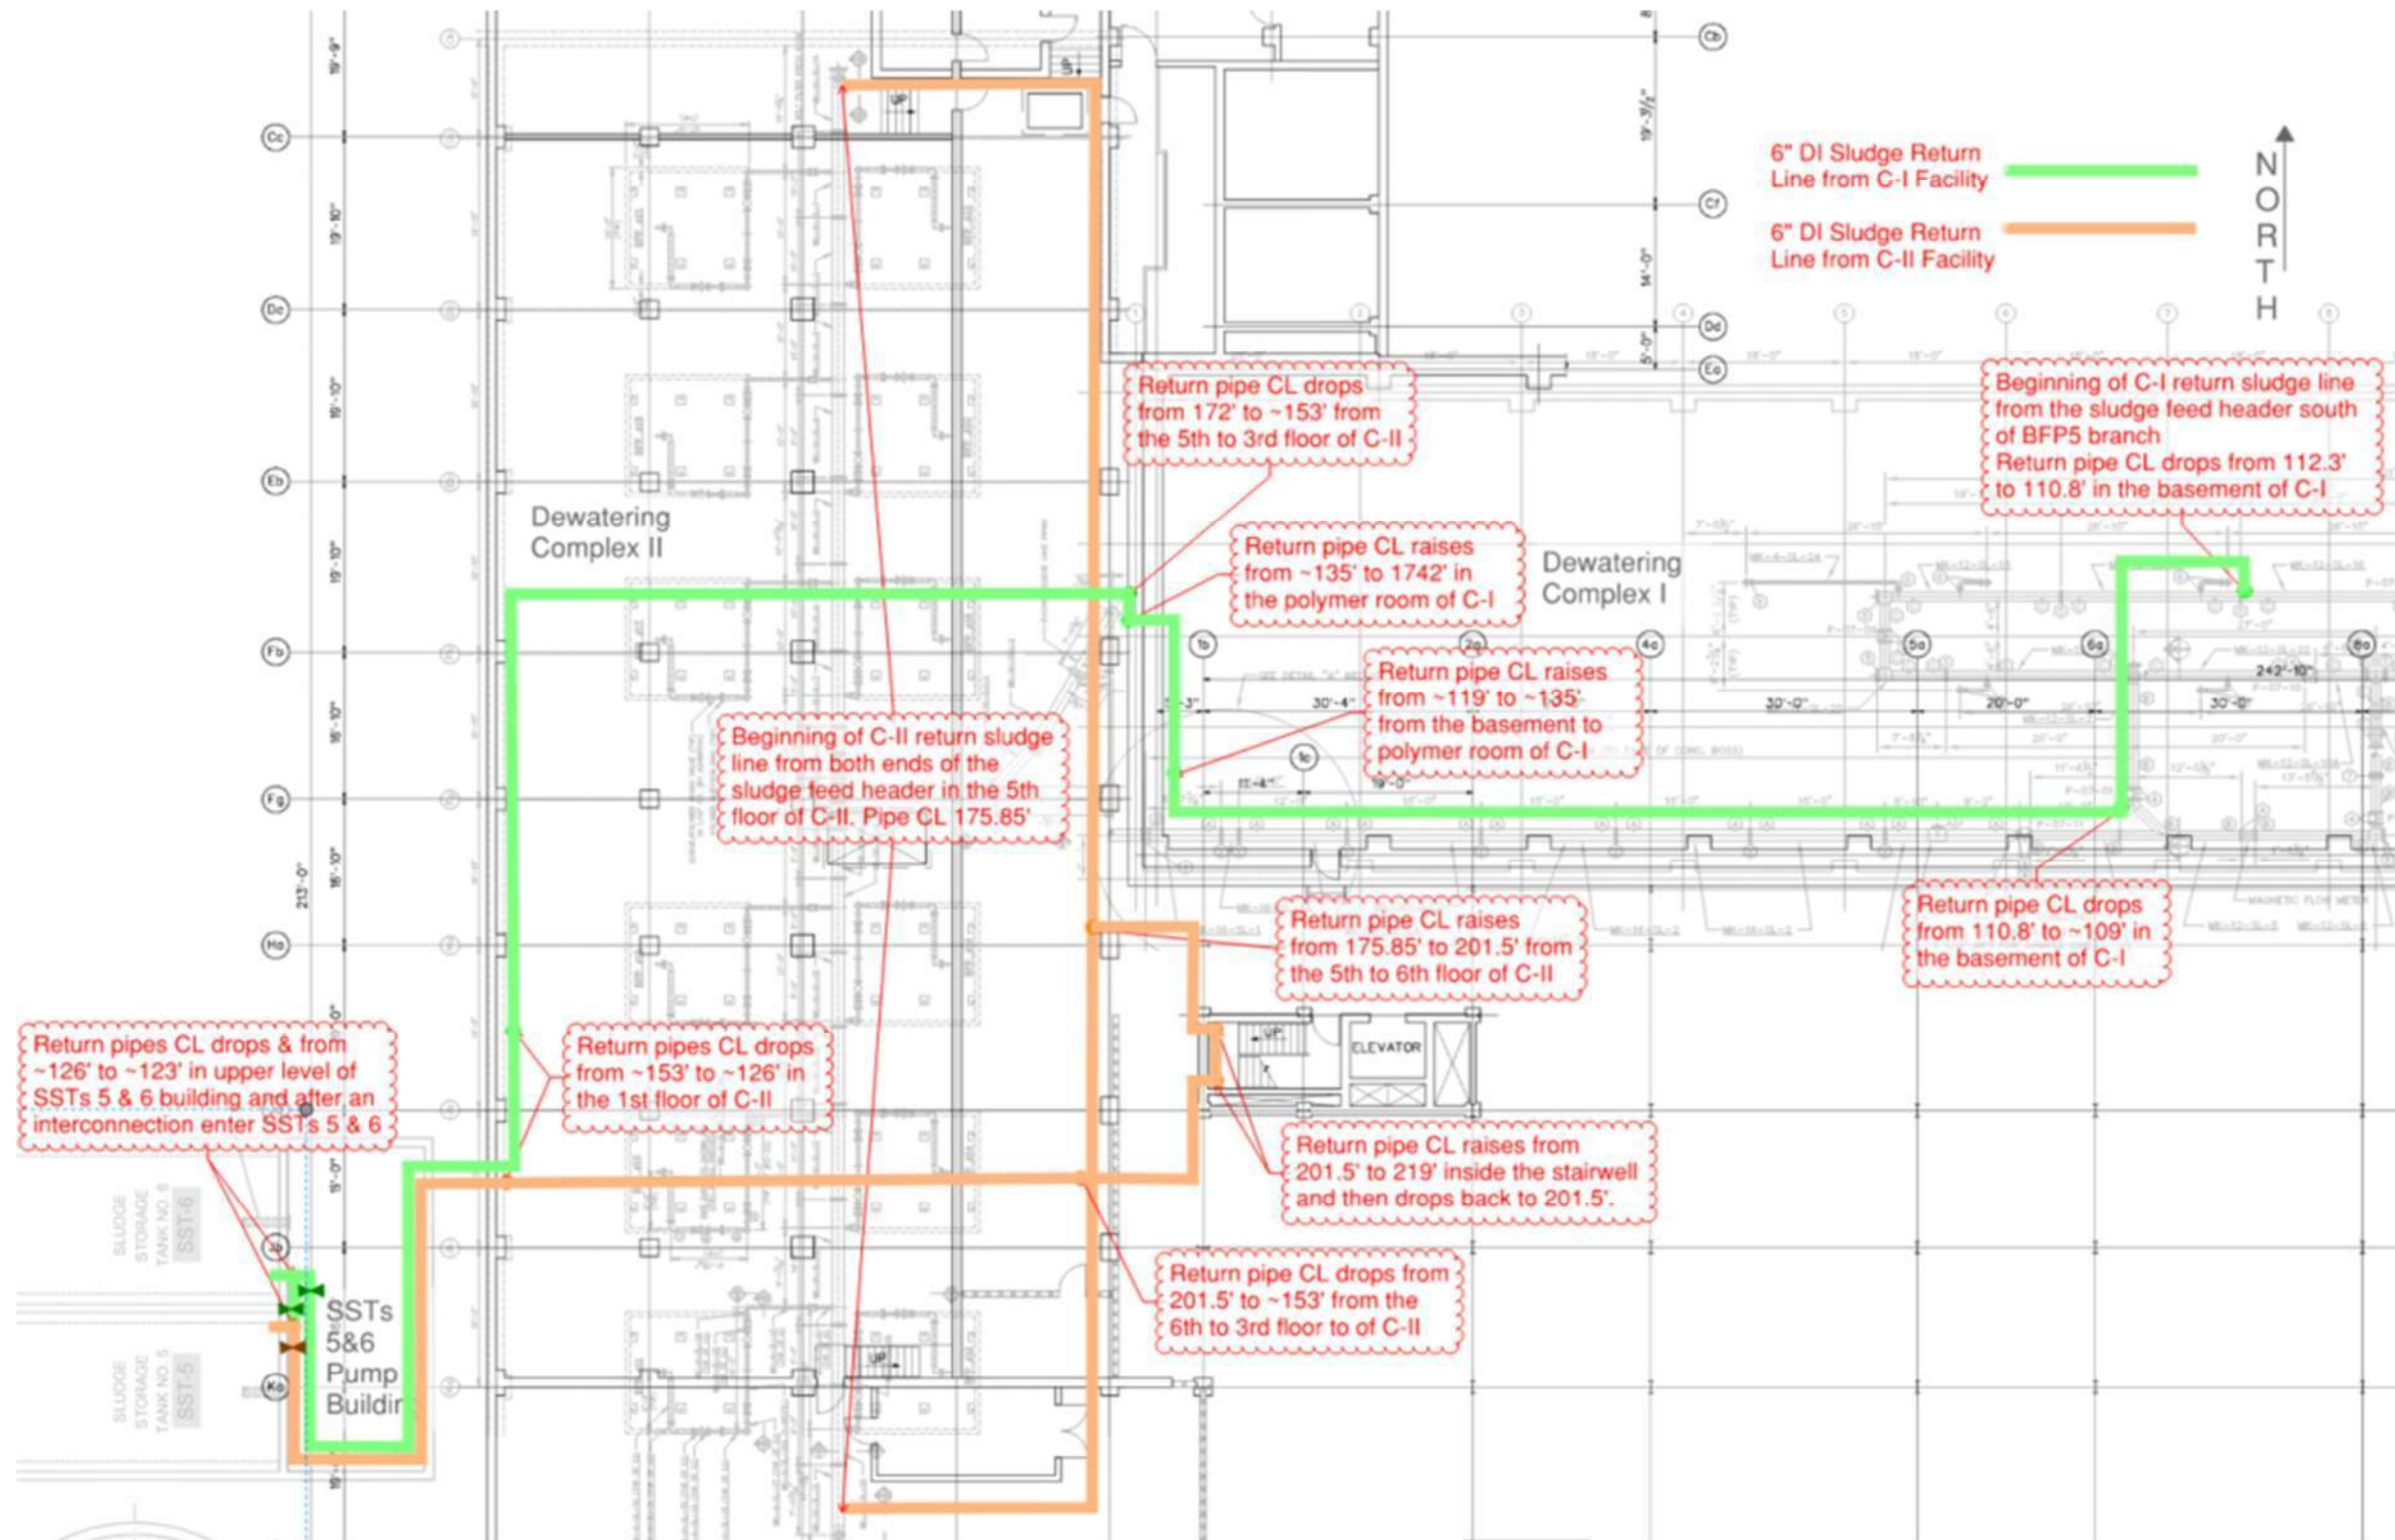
Proposed C-I and C-II Excess Sludge Return Pipe Routing
